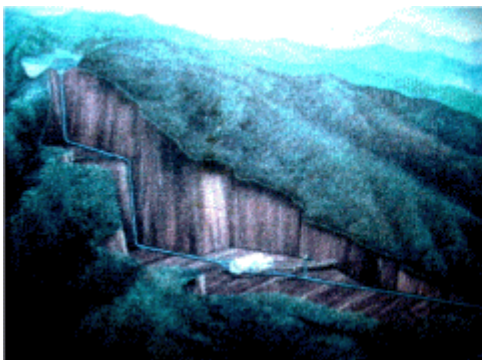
Underground Laboratory constructed in YangYang pumped storage Power Plantg
